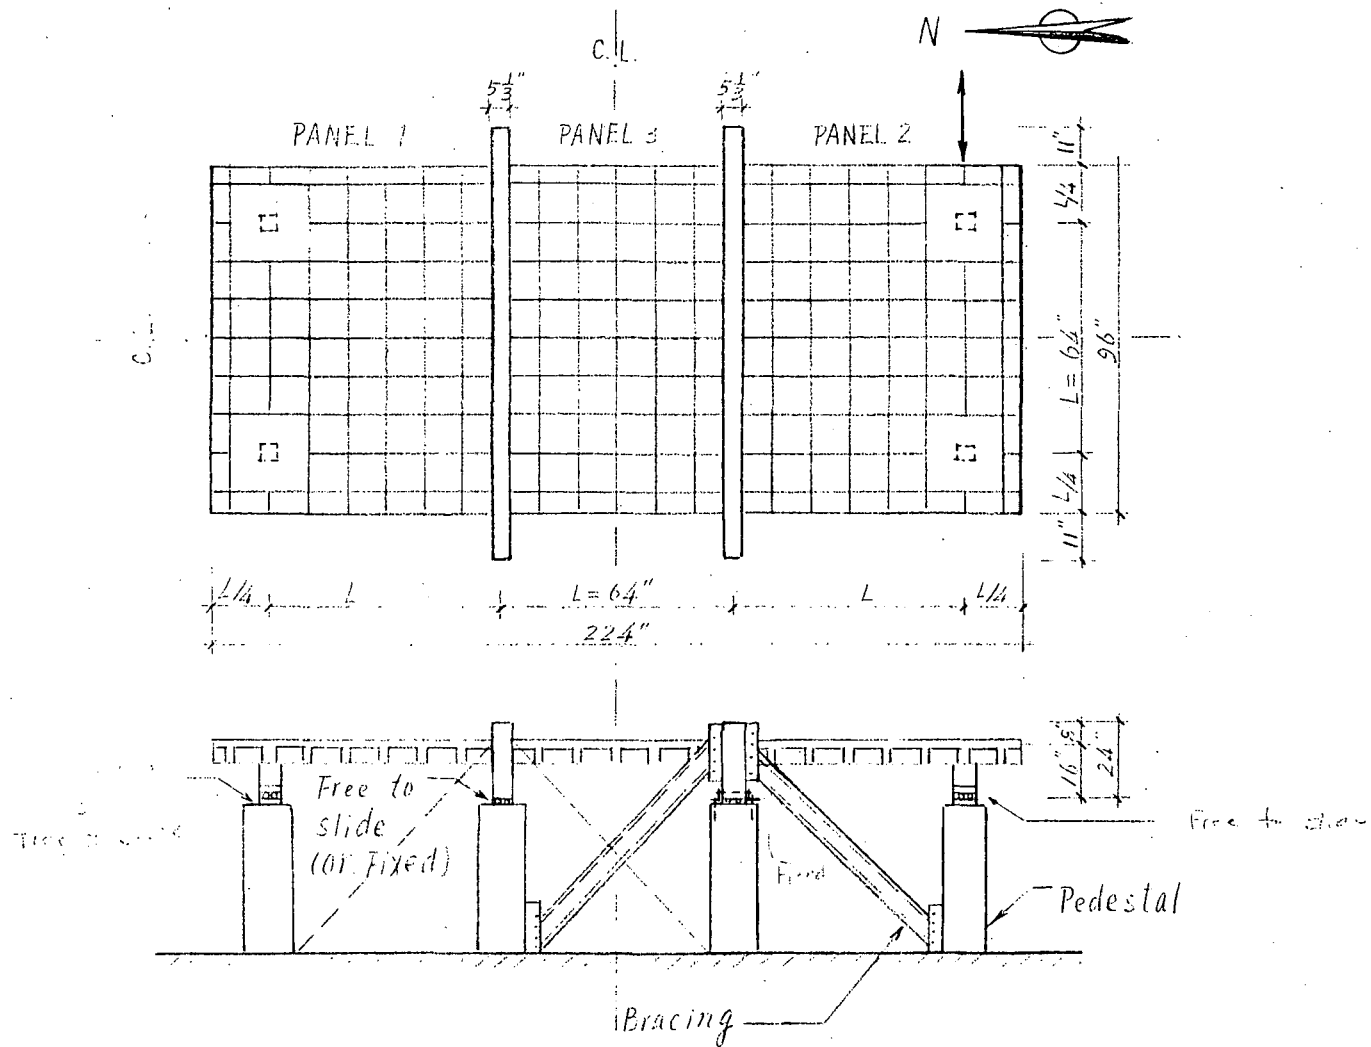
General Dimension and Test Setup of the Specimen.
